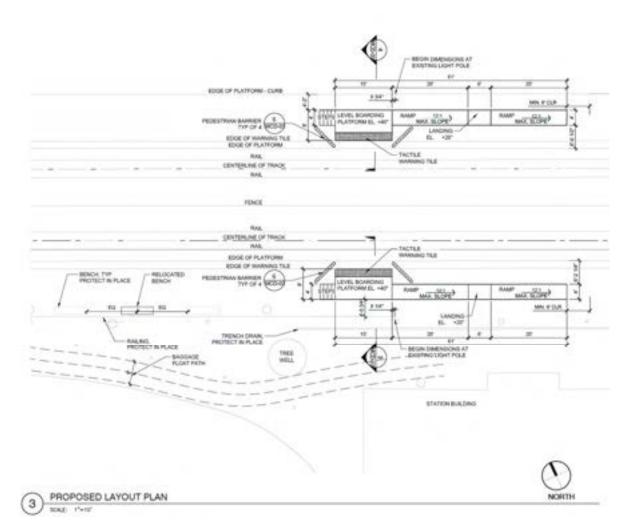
Merced Station – Proposed Bolt Down Mini-High Layout Plan
